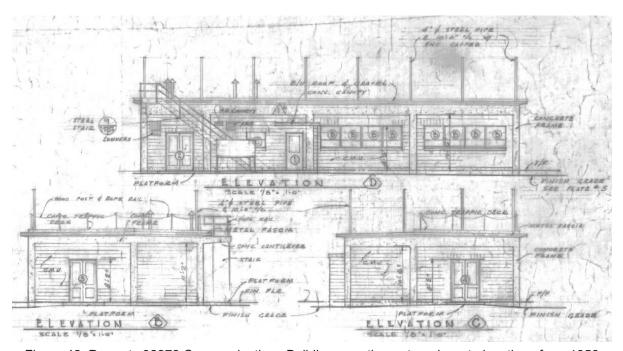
Property 32272 Communications Building - south, east, and west elevations from 1958 WS-HK plans.
